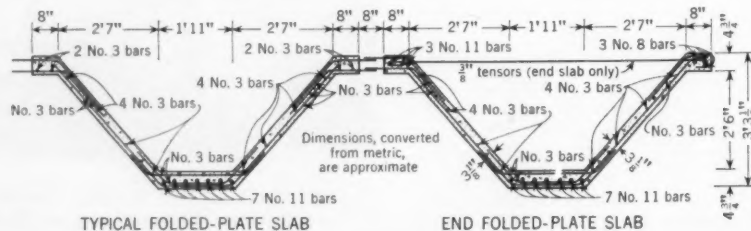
Transverse section of precast folded slab used to span 75 ft 7 in. and cantilever an additional 7 ft 10 in. at each side.
